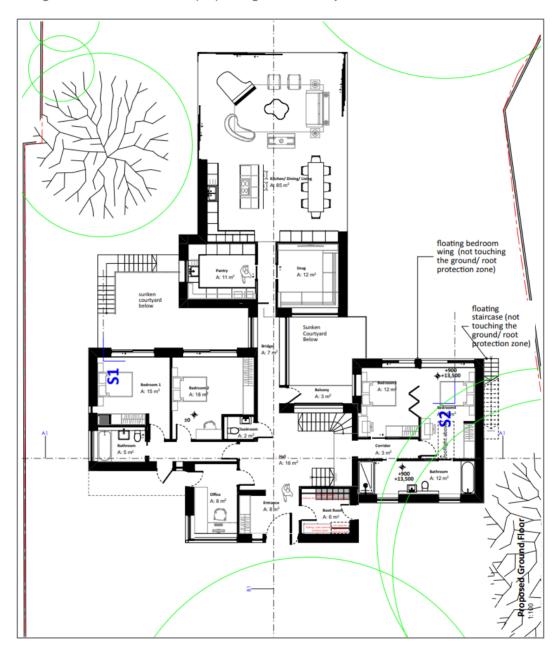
Proposed Ground Floor Layout - Holland Green (September 2024)
